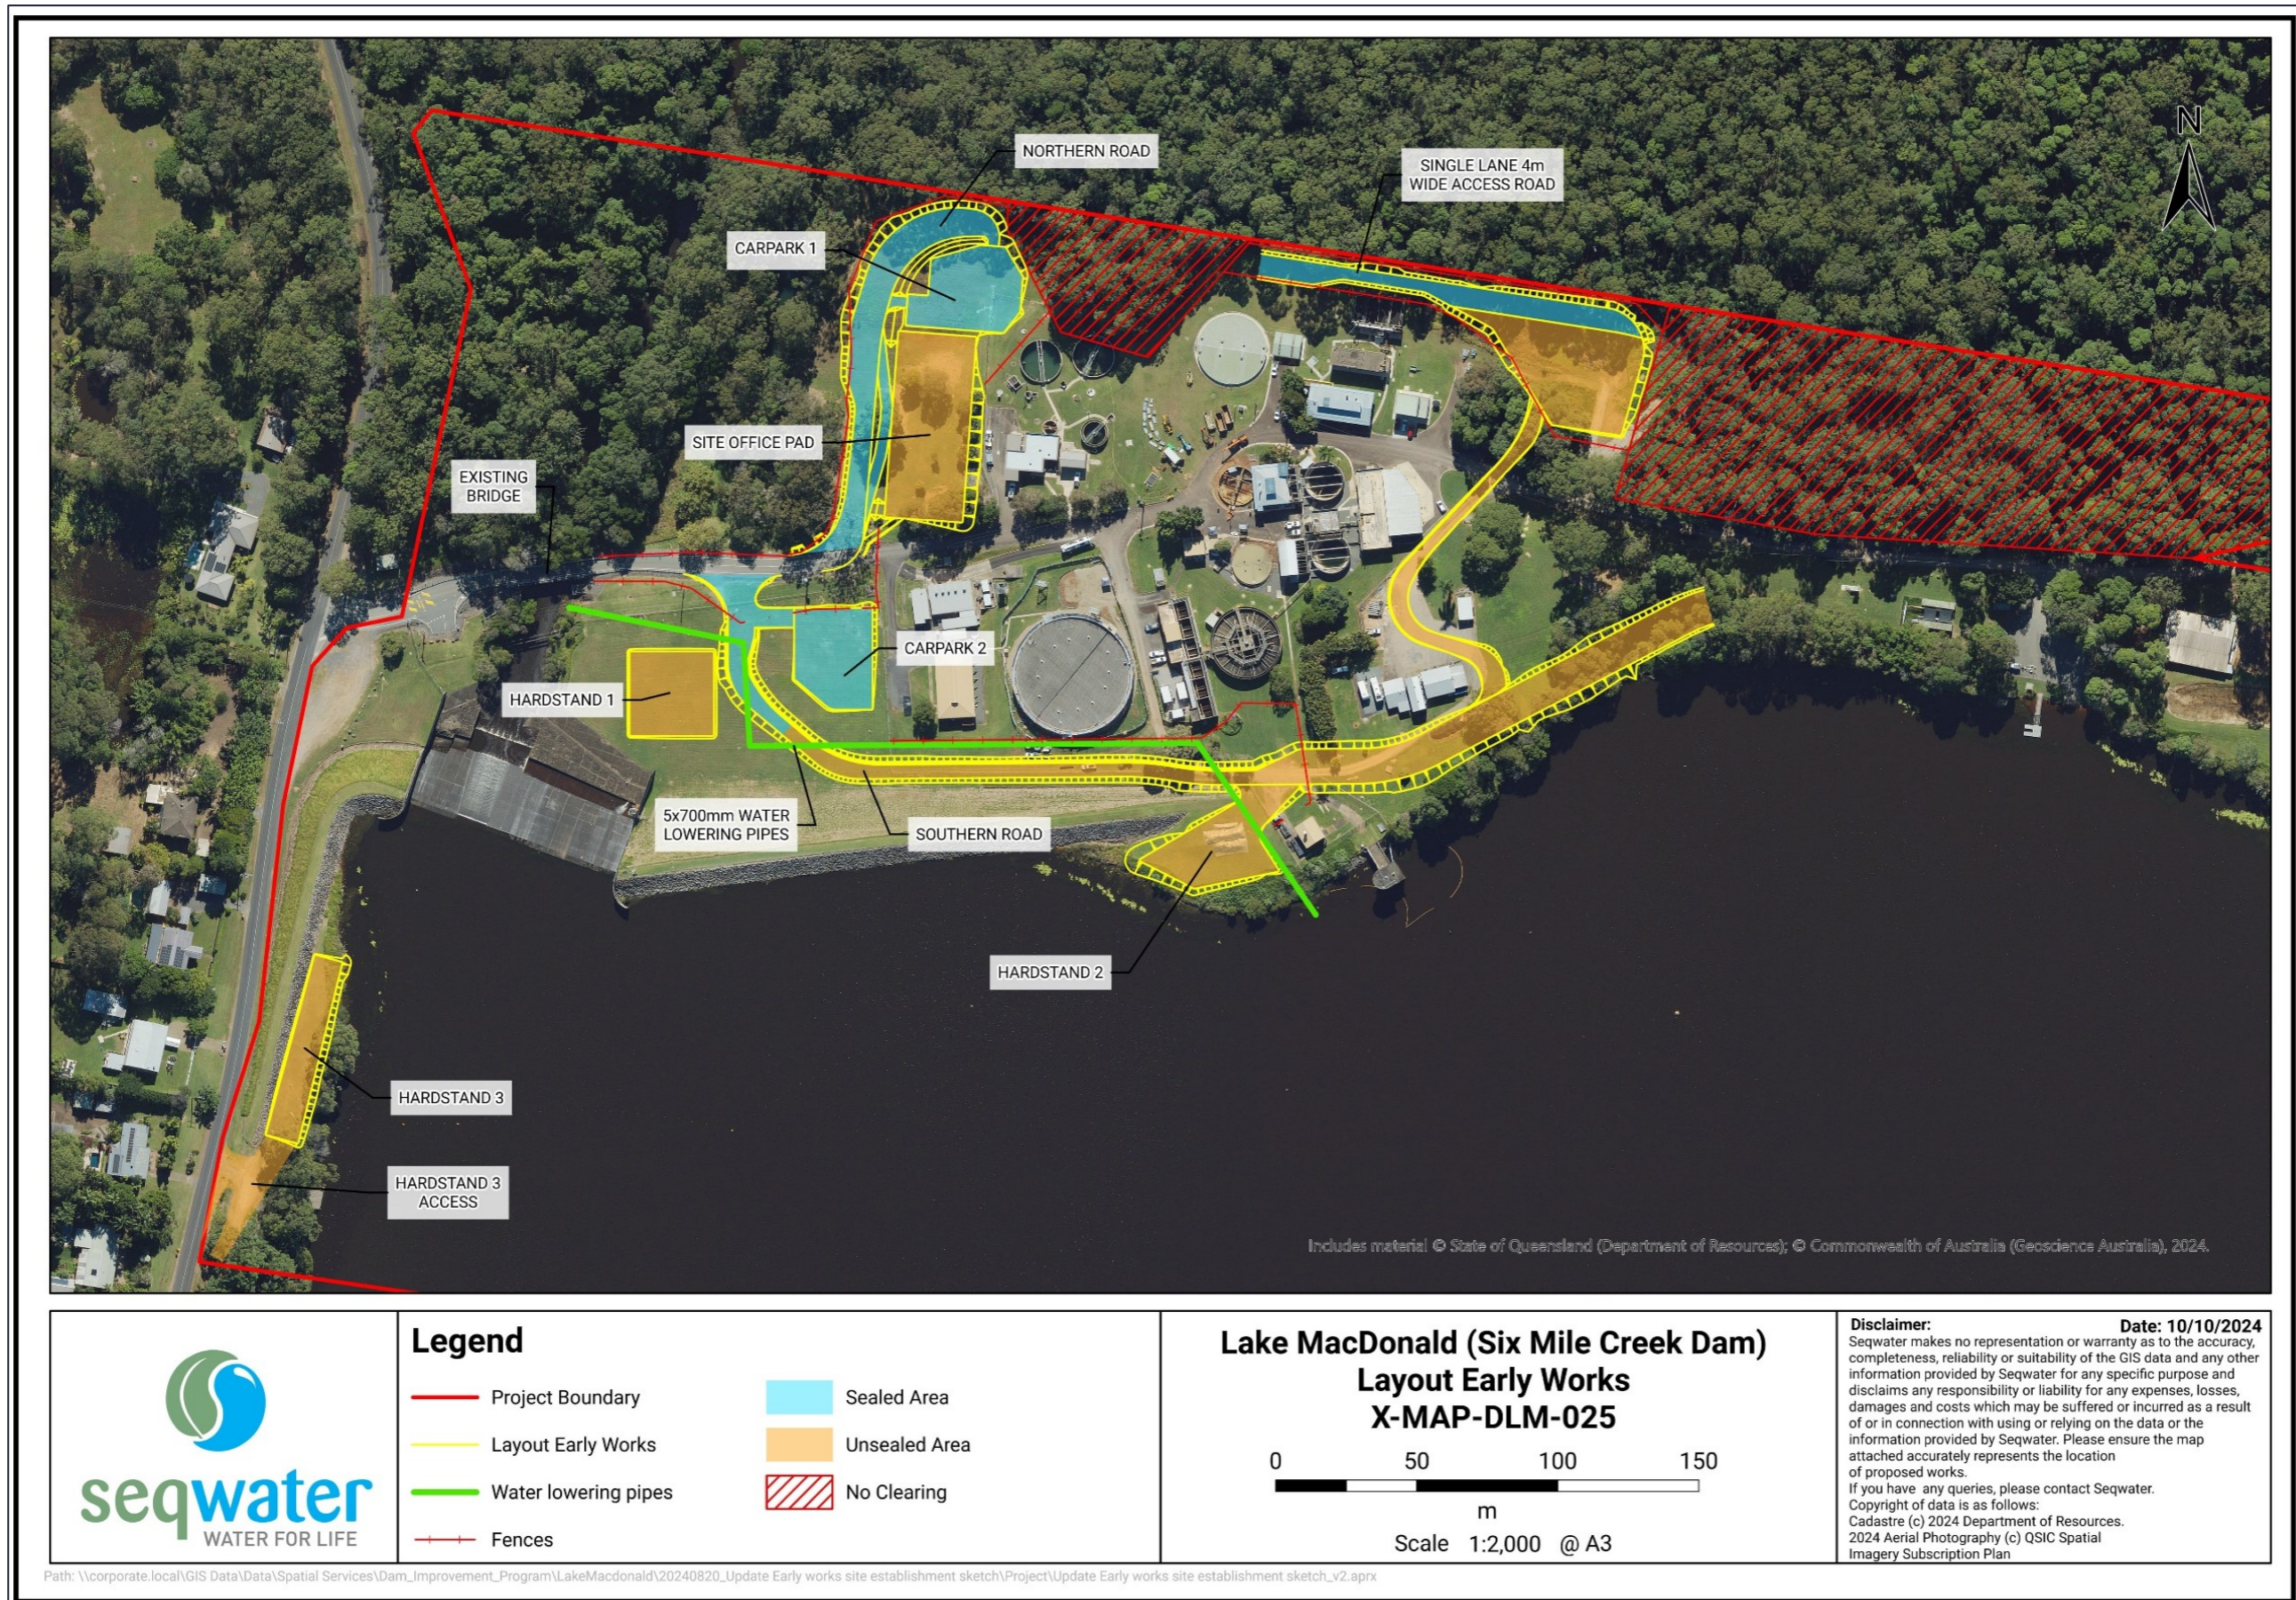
Civil Works – Temporary Roads General Arrangement – Early Works (source Seqwater)
